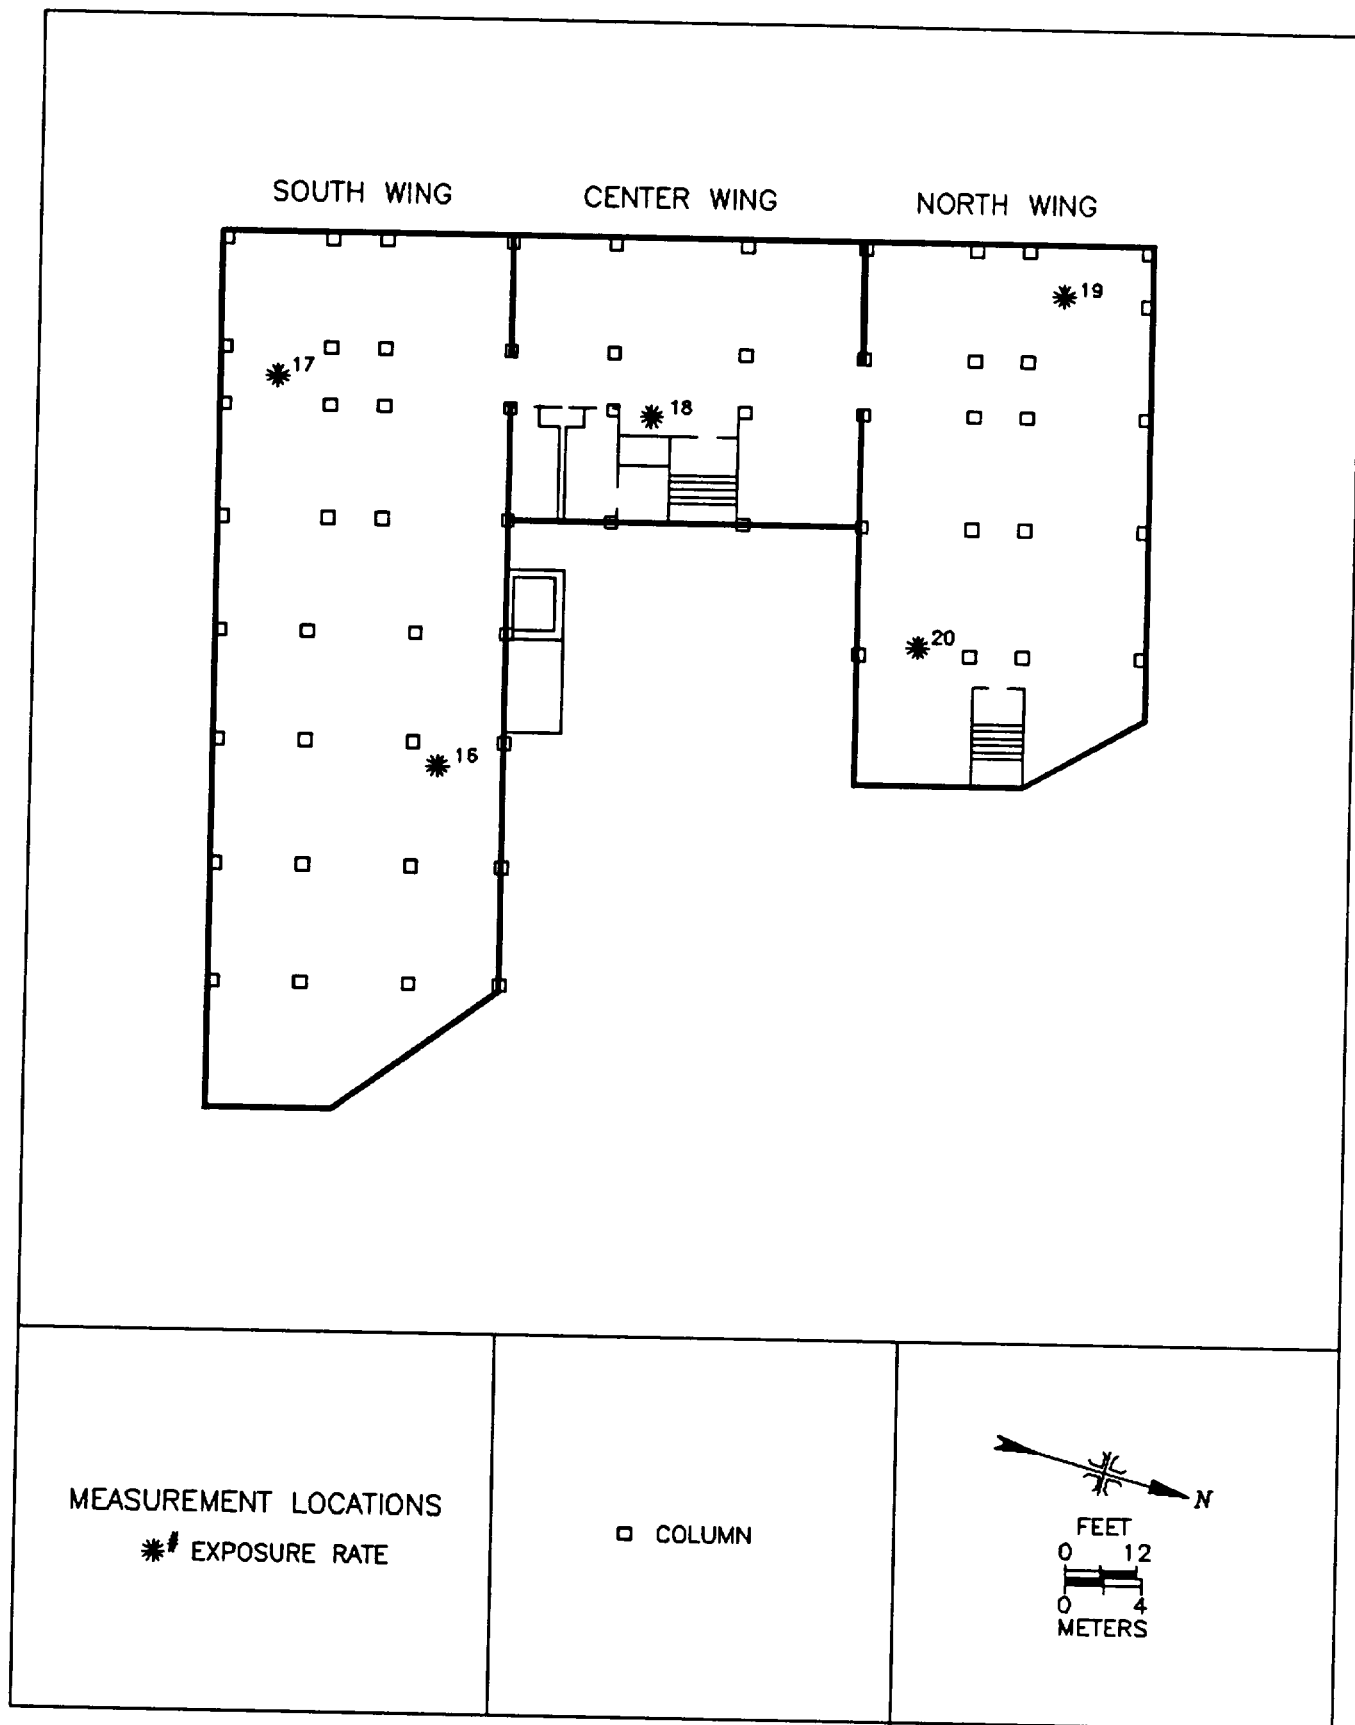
Building 7, Fourth Floor – Exposure Rate Measurement Locations
